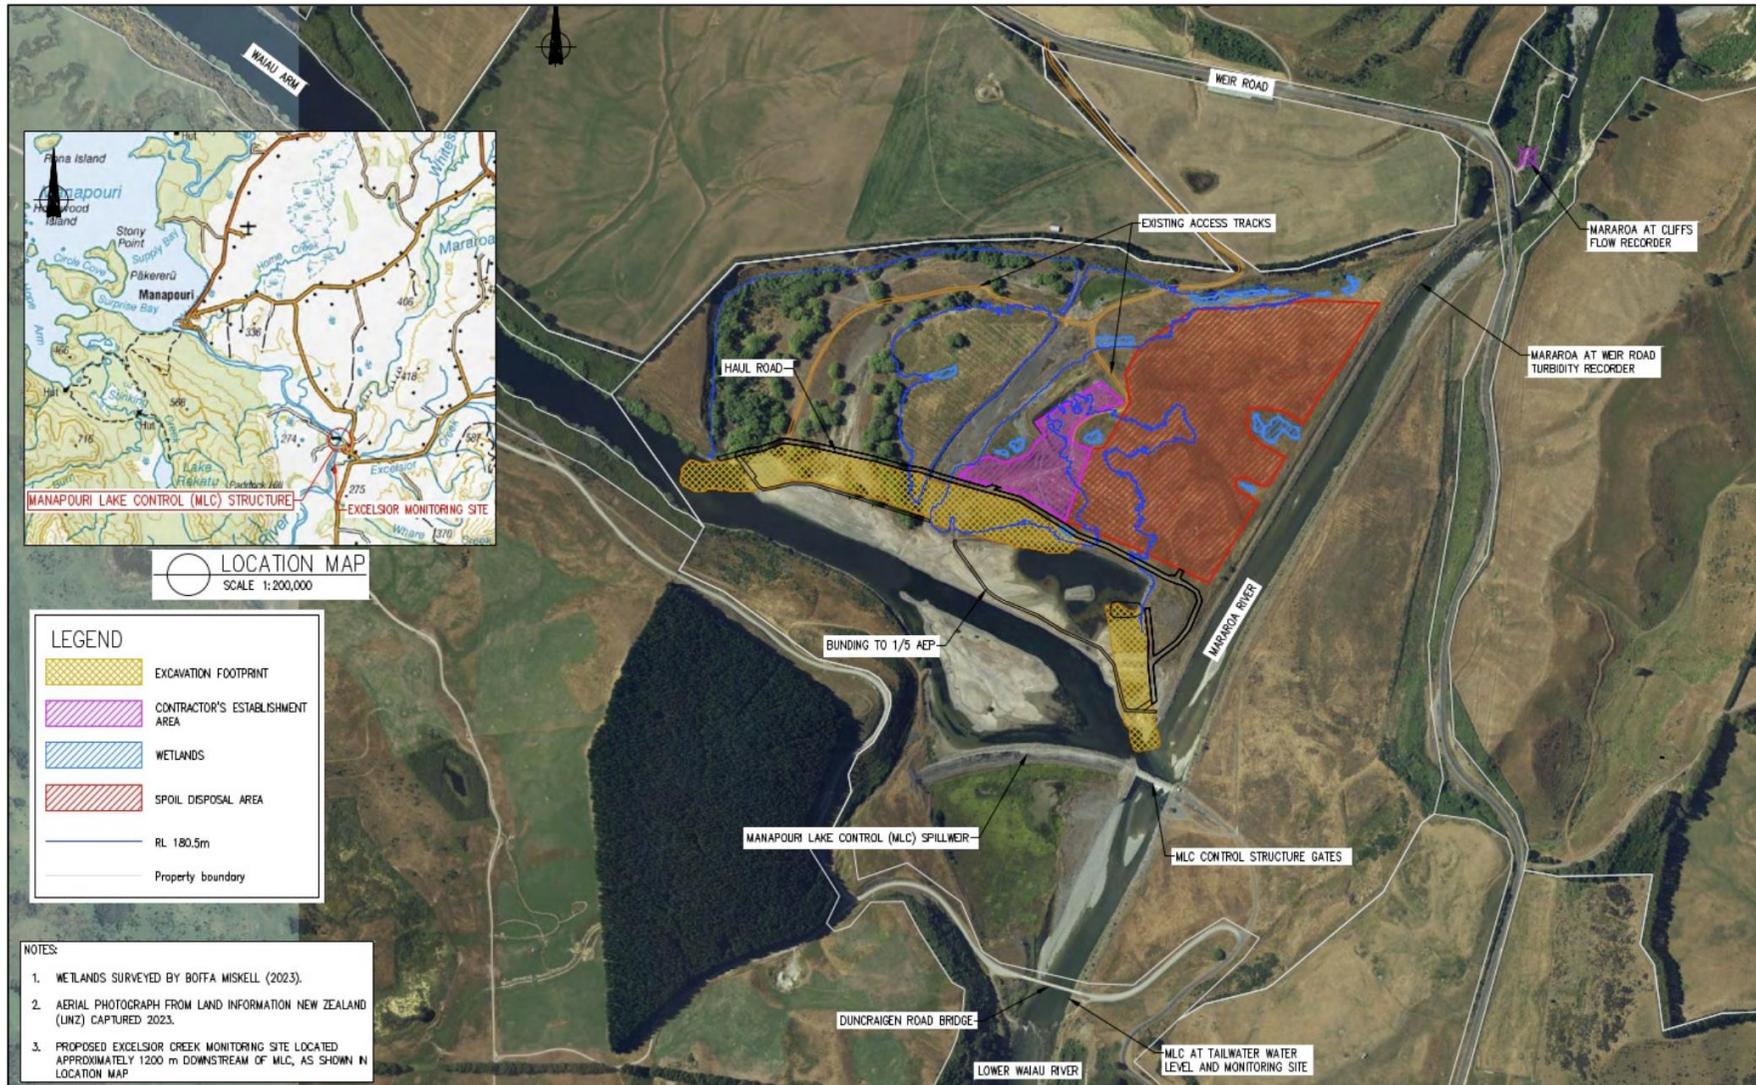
Site location plan (Source: Figure 1.1 of the AEE)
